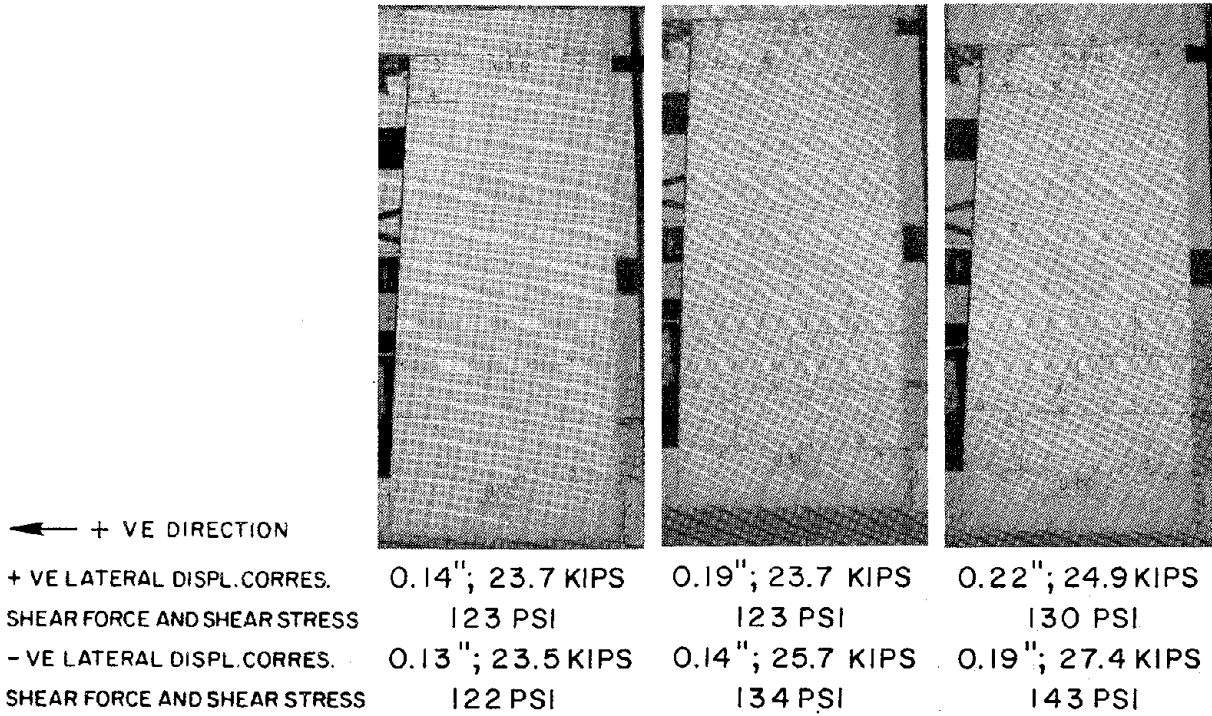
SUCCESSIVE CRACK FORMATION TEST 13. (RIGHT SIDE PIER)
